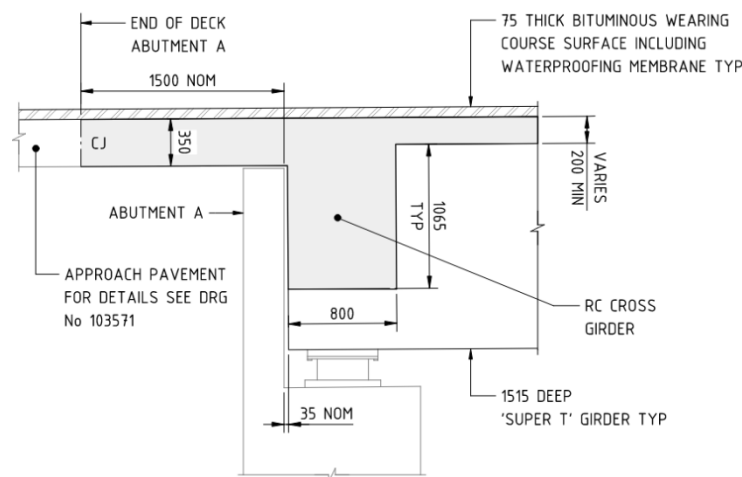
Typical Seamless pavement detail at the super-T bridge abutments
